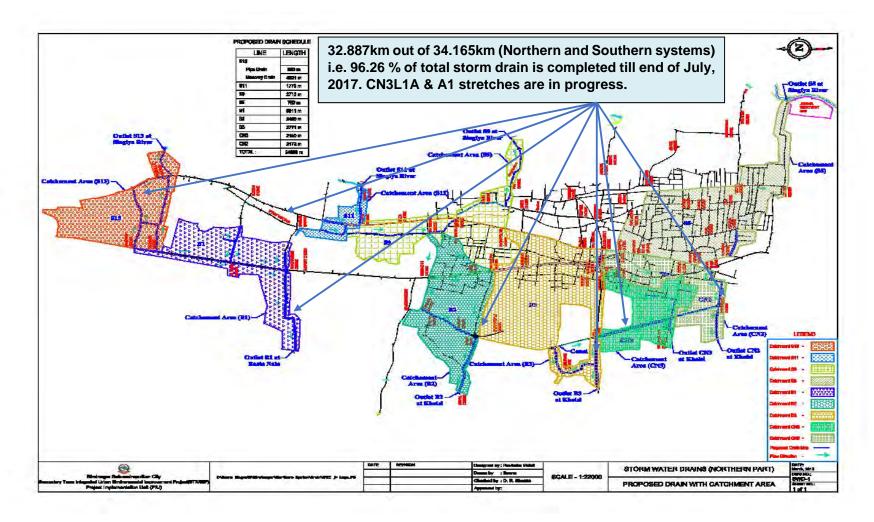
PROPOSED STORM WATER DRAINS IN BMC (Northern Drainage System)
